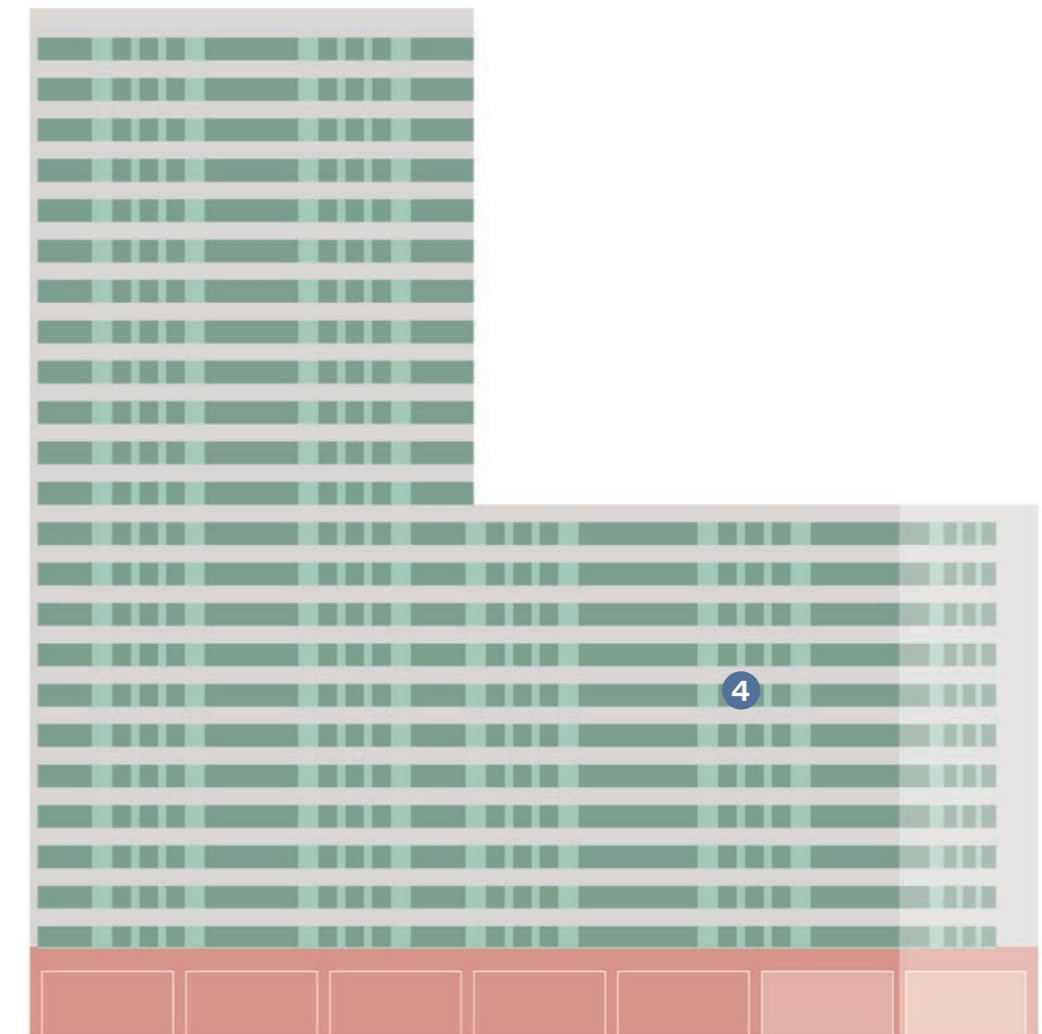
Building C (Enterprise Yard) Facade Principles - 03
